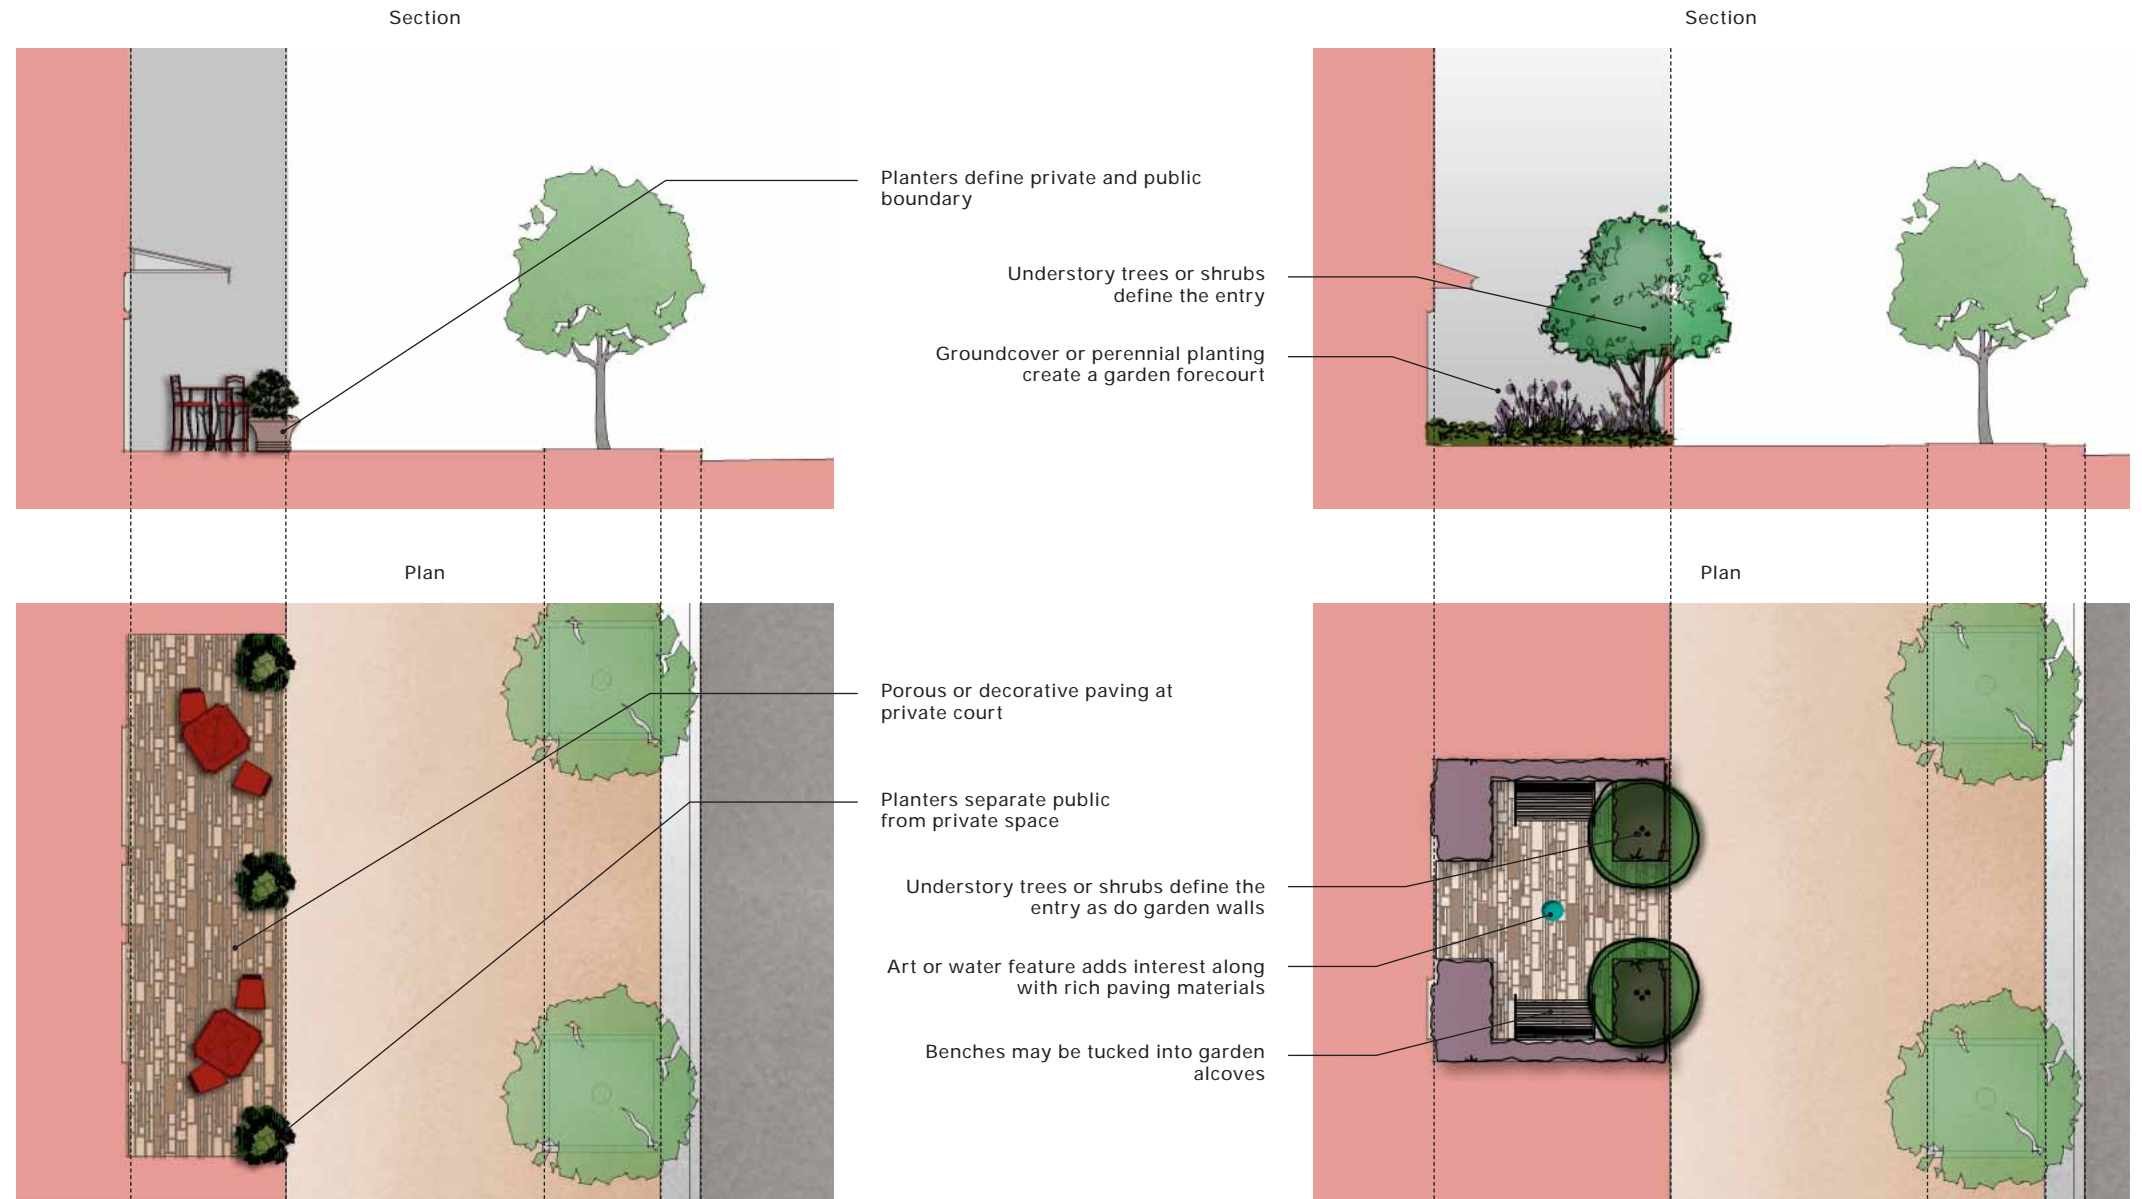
Typical commercial frontage with at grade terrace showing proposed planting in plan and elevation
